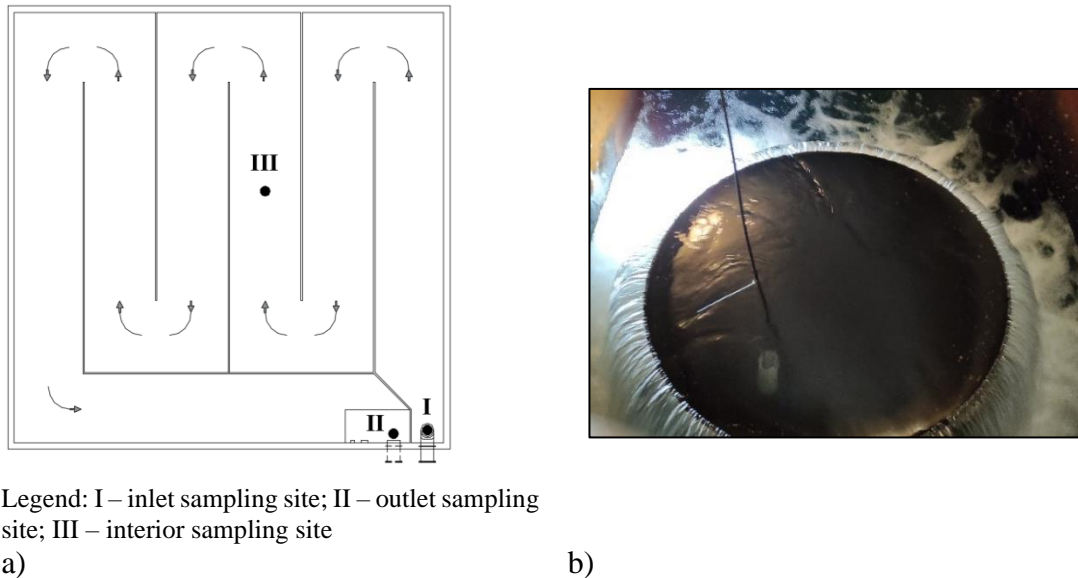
Full-scale tank: a) layout and location of monitoring equipment; b) inlet pipe upper view.
